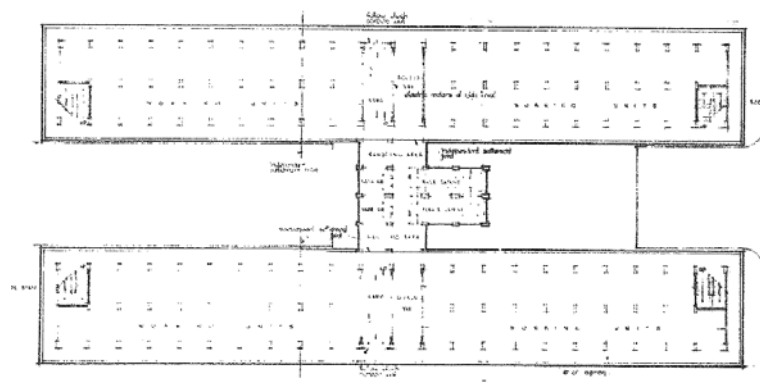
Ground floor plan revealing the H-shape of the factory estate's layout.
